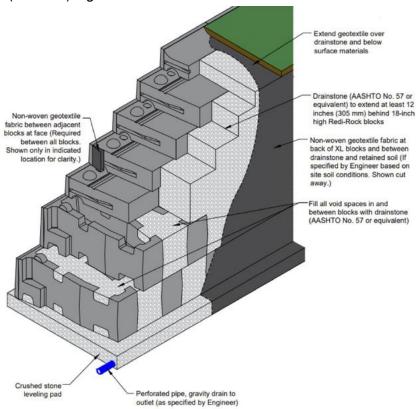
Isometric view of non-woven geotextile separator for 36 in (914 mm) high XL blocks
